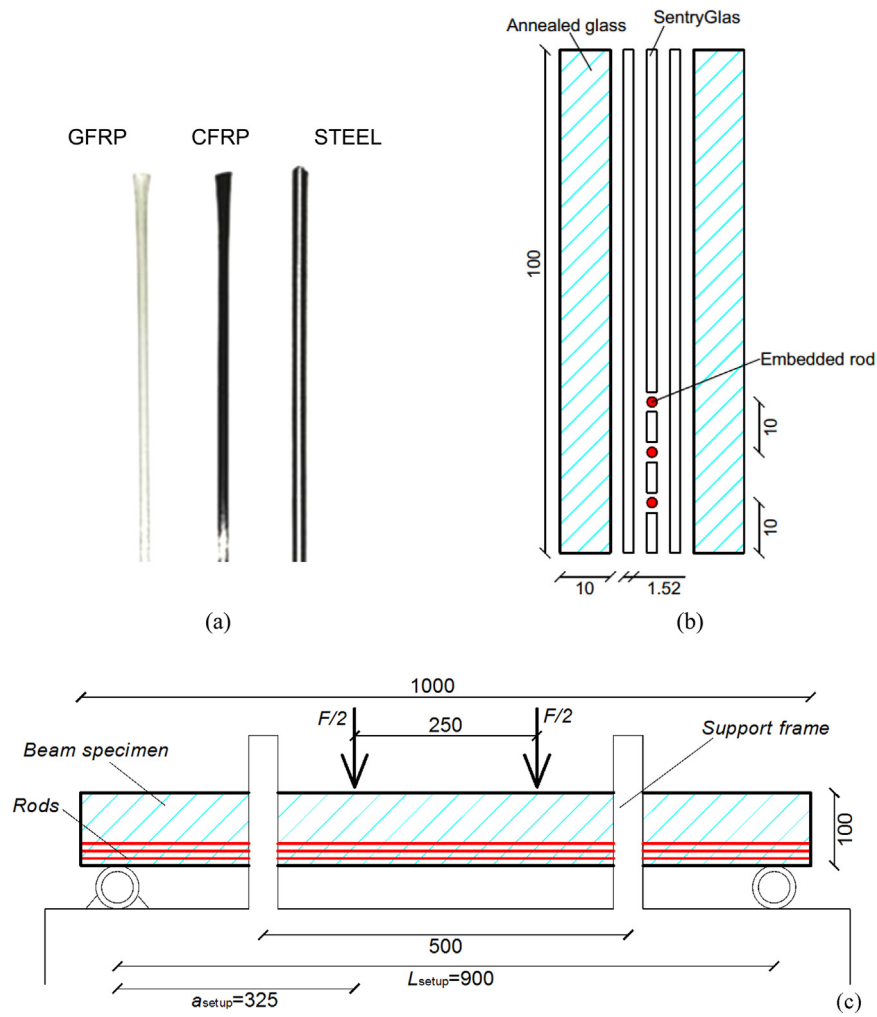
(a) GFRP, CFRP and steel rods in use, with (b) nominal cross-section (exploded view) of the reference beam specimen [15], and (c) test setup (front view). All the dimensions are given in mm.
